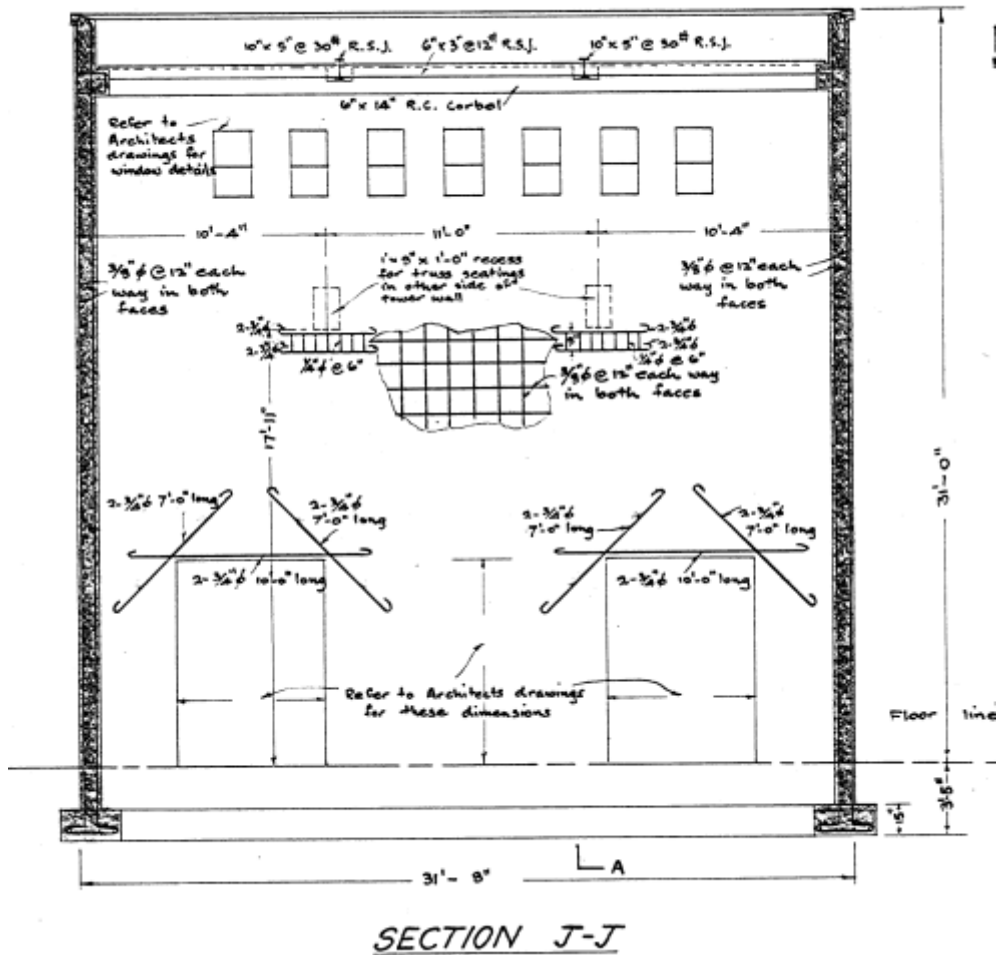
Concrete Shear Wall Elevation on War Memorial Tower
